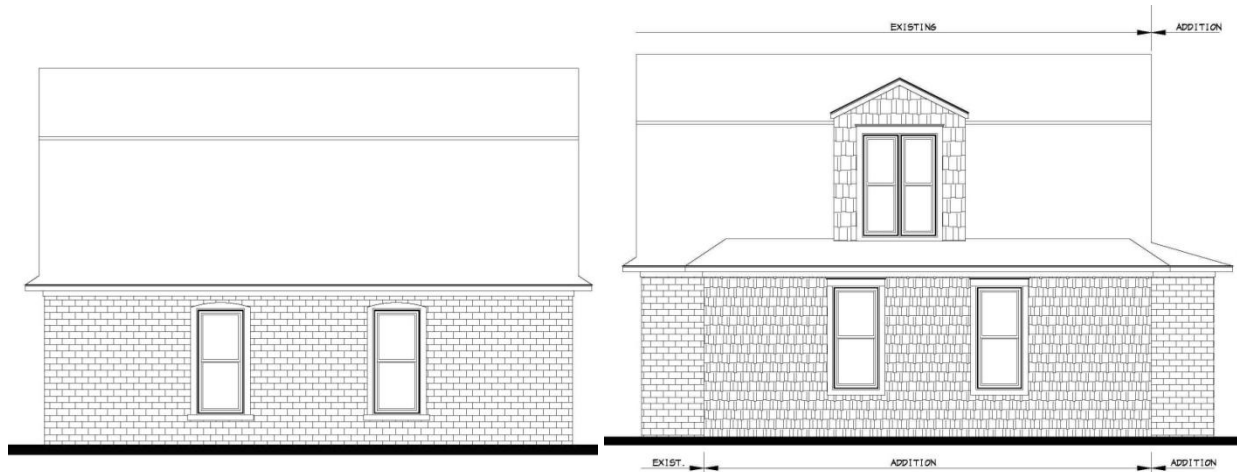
541 Highland Ave., existing (l) and proposed (r) south elevation, 2015.
